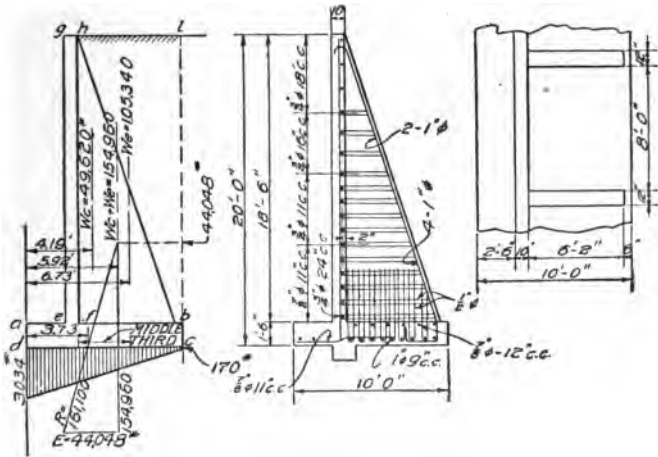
Design Diagram for Retaining Wall with Counterforts
